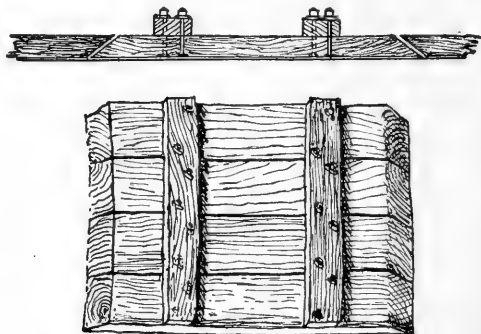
APPEARANCE OF DOOR IN STAVE SILO AFTER BEING SAWED OUT, AND SIDE VIEW OF DOOR IN PLACE. (CLINTON.)
